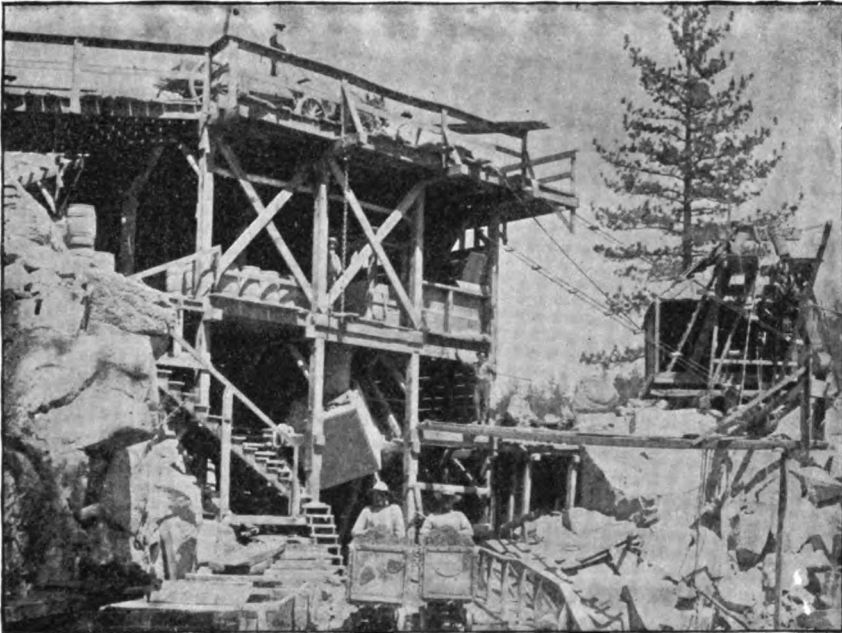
HEMET DAM CONSTRUCTION PLANT.
